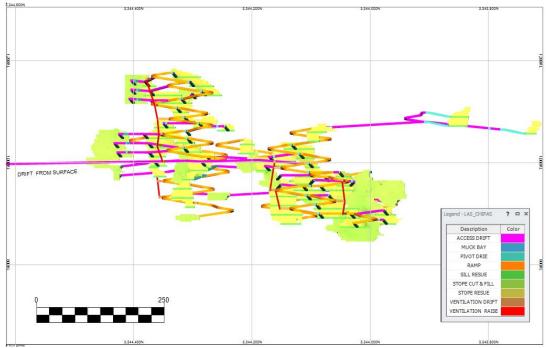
Main Access Drift and Decline for Babicanora Norte – Plan View
